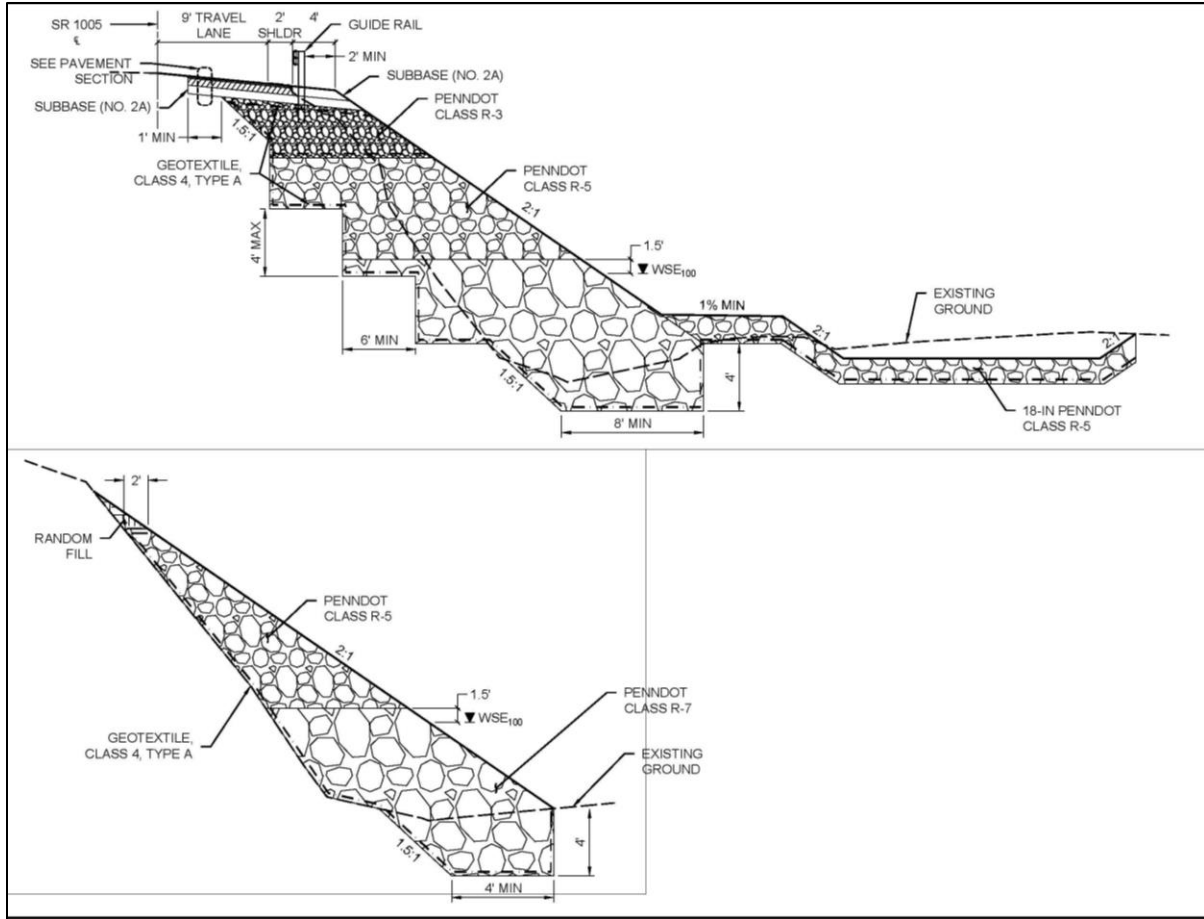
Detailed design of Alternative 2A Channel modification with streambank stabilization with riprap
